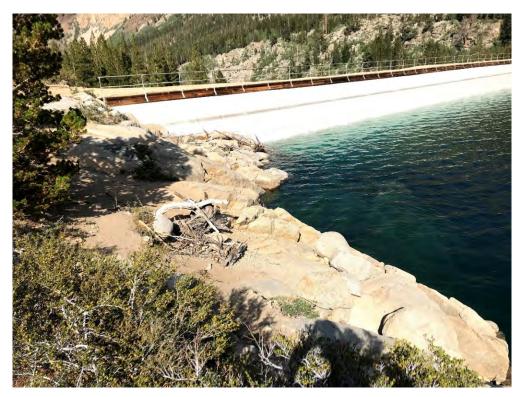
Fishing Access on Upstream, Western Side of Hillside Dam
